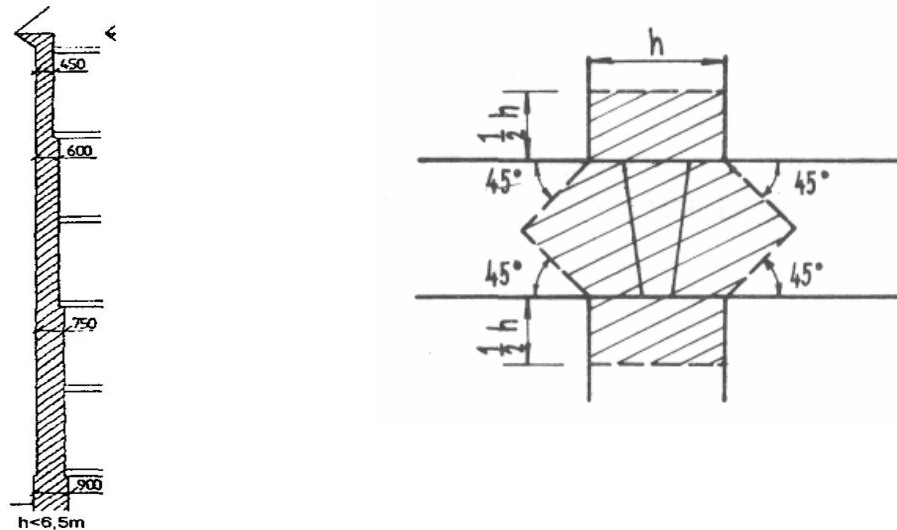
Gradually strengthened masonry wall, 1b) joint reinforced by ties.
